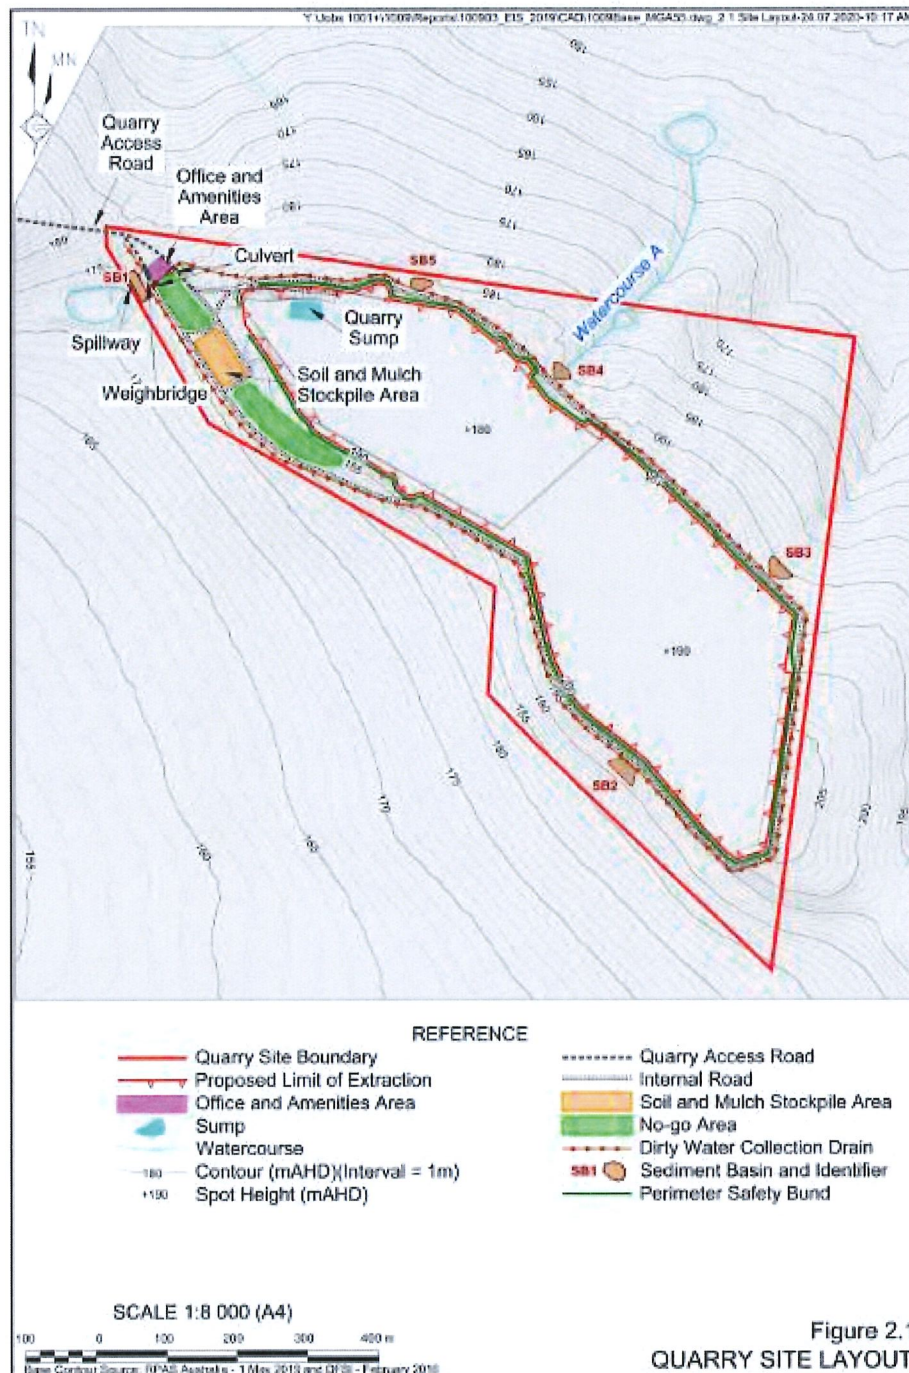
Existing Hillview Quarry Layout, plan supplied in EIS.
